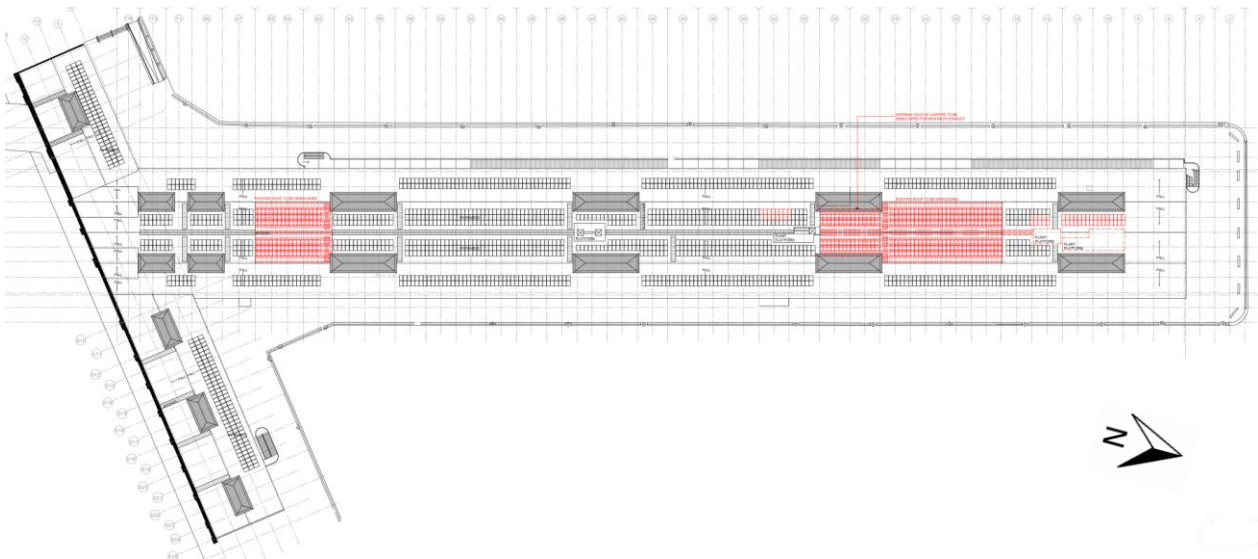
Roof plan. Highlighted in red the demolitions. Plans by Hassell.
